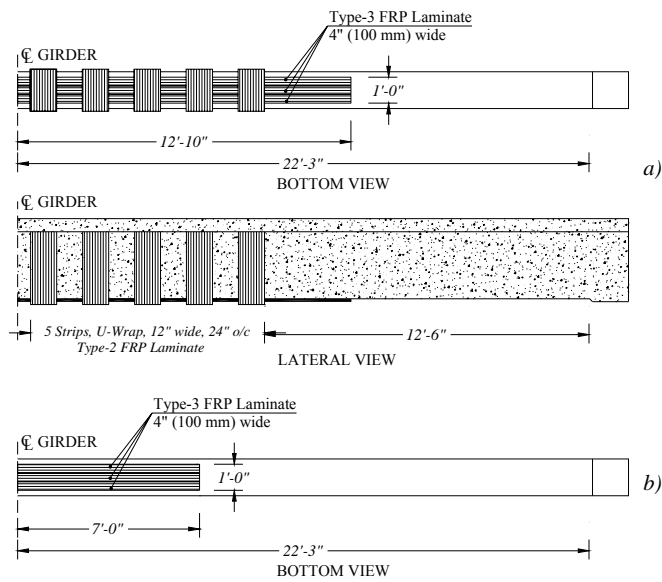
Type-3 FRP Flexural Reinforcement: a) Interior, and b) Exterior Girders
